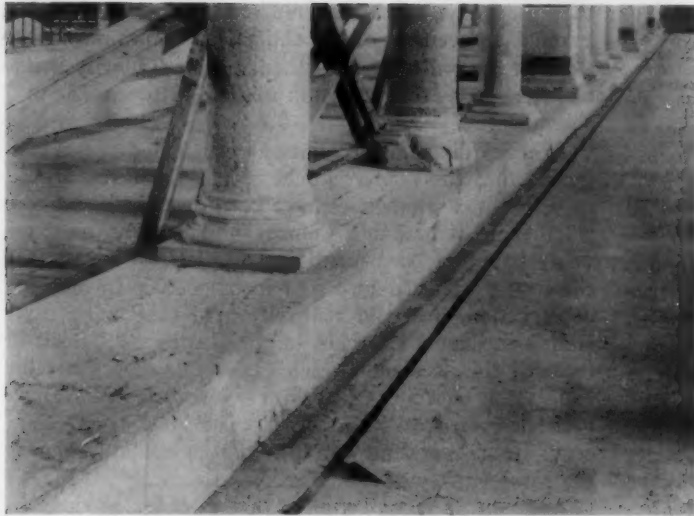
PISA CATHEDRAL. CURVE IN PLAN NORTH GALLERY AISLE COLUMNS AND SUPPORTING PARAPET, LOOKING WEST
